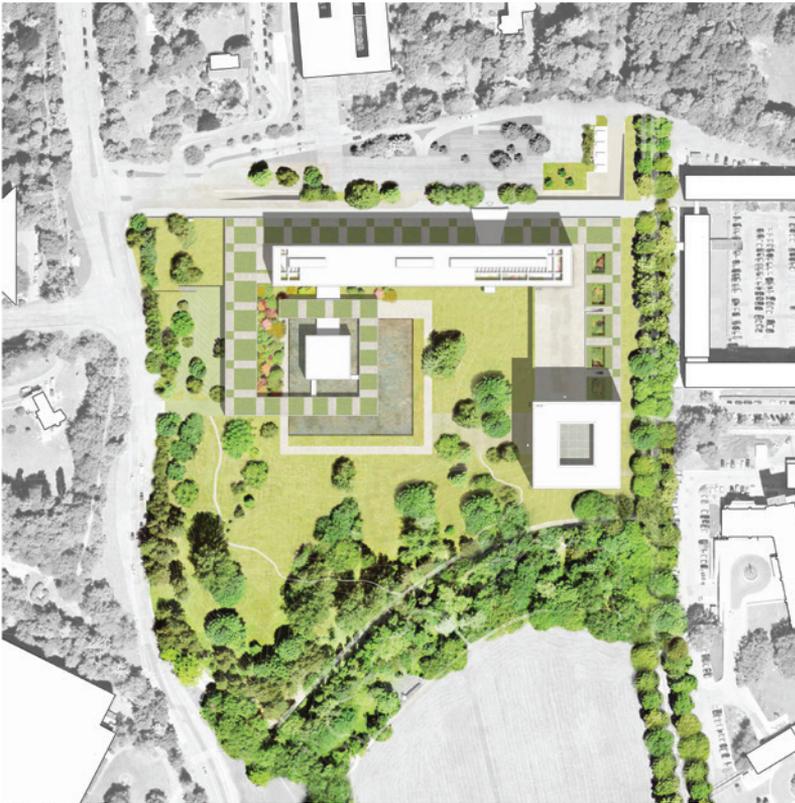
Site plan. Berrel Berrel Kräutler AG. Zürich.
